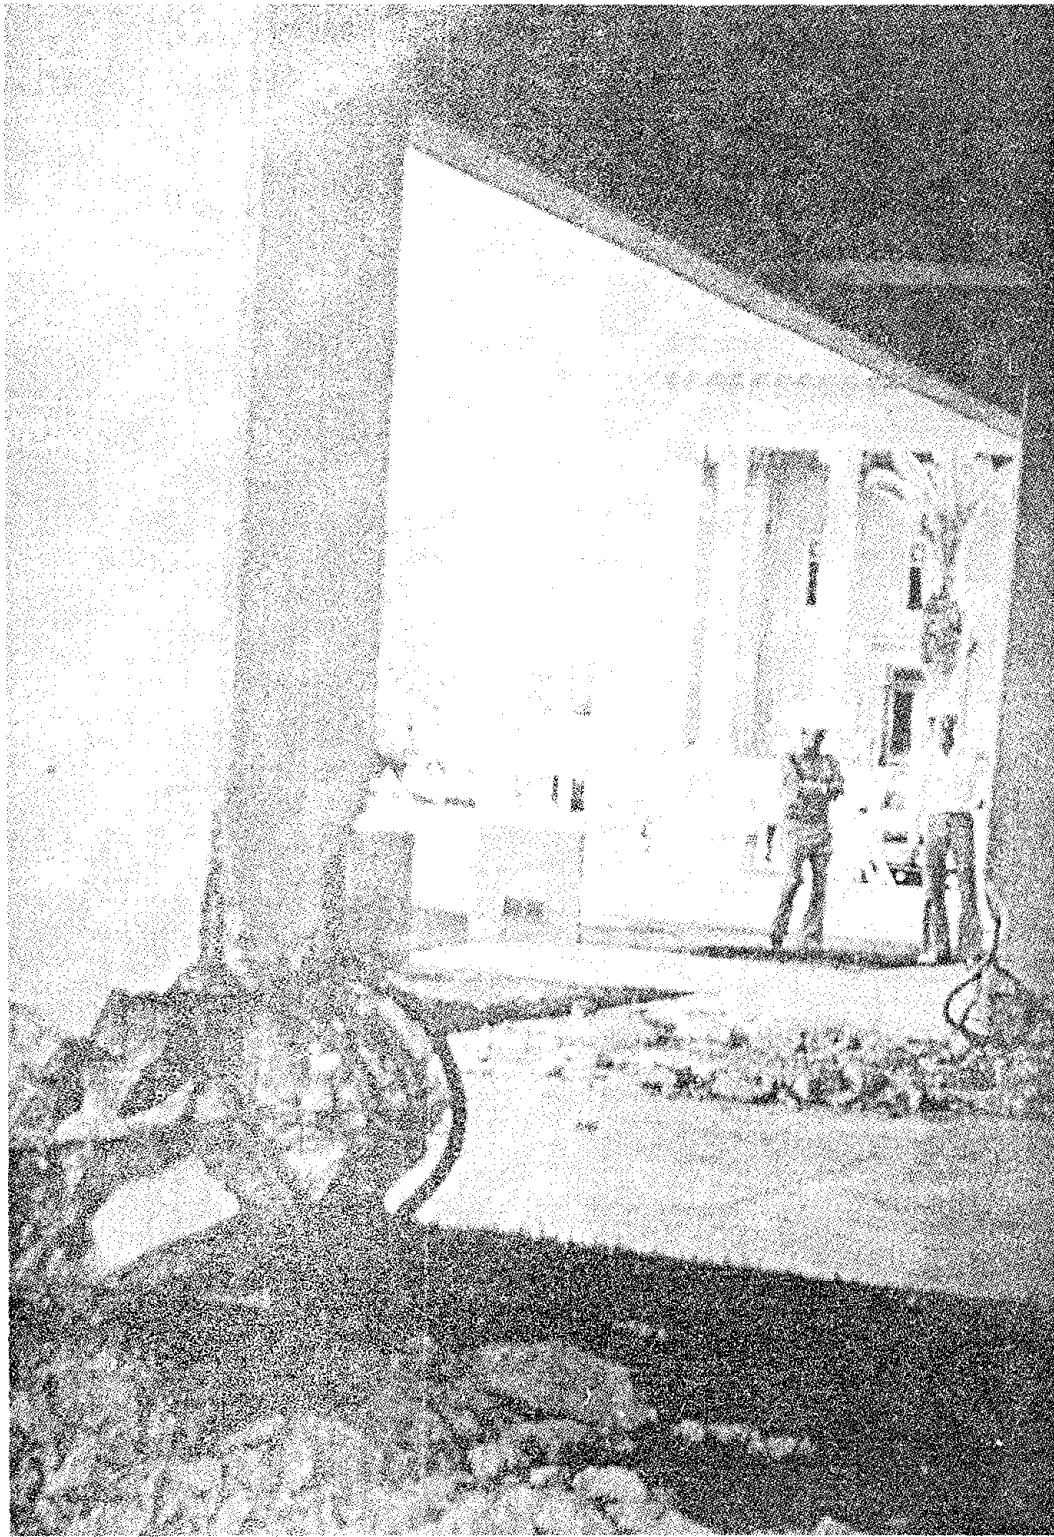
The original Imperial County Services Building is visible beyond the failed columns of the new, reinforced concrete building.
